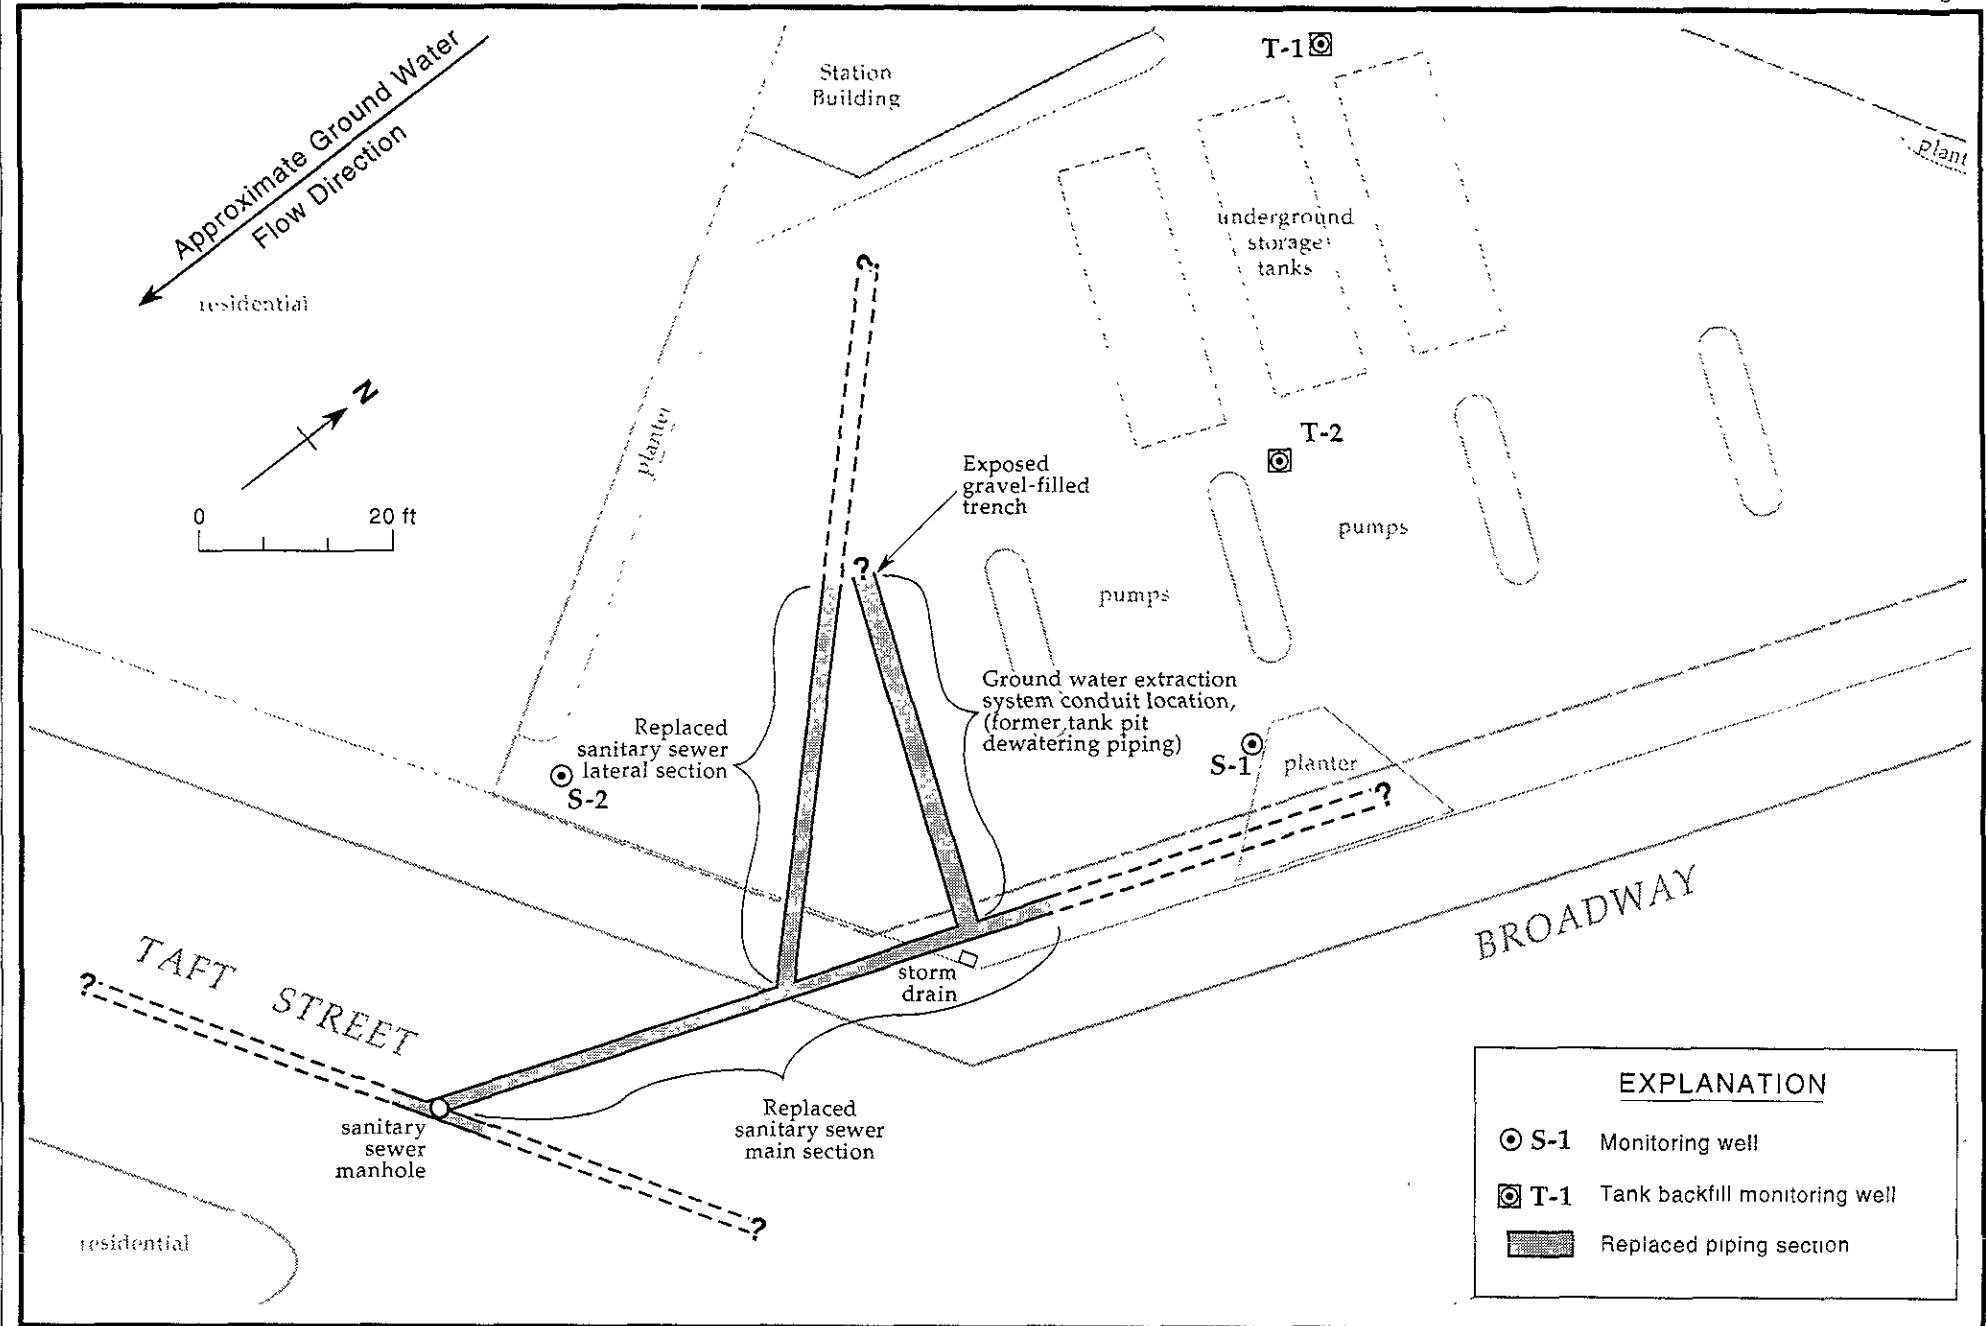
Sanitary Sewer Excavation and Piping Locations - Shell Service Station WIC #204-2004-0204, 5755 Broadway, Oakland, California
